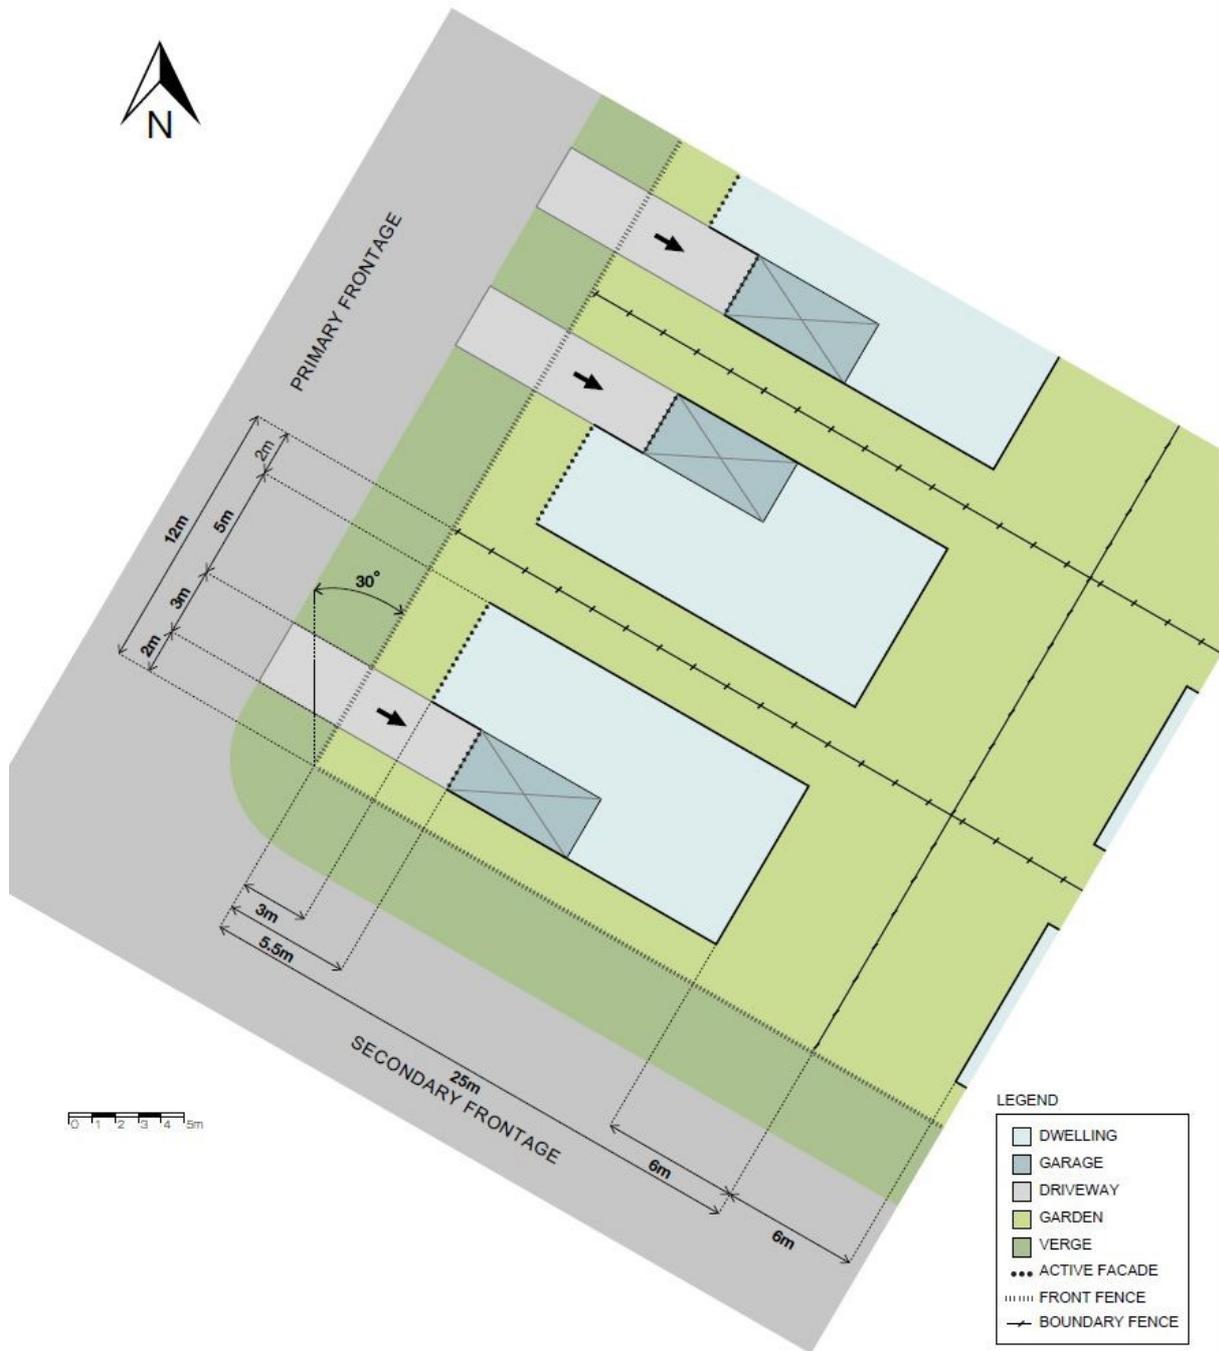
Example lot and dwelling layout of dwellings within Precinct A designed in accordance with the acceptable solutions under clauses BRI-S9.7.2.1, BRI-S9.7.2.3, BRI-S9.8.1, and BRI-S9.8.6.1, where access is from the primary frontage and the lot frontage is not between 30 degrees east and west of north.
